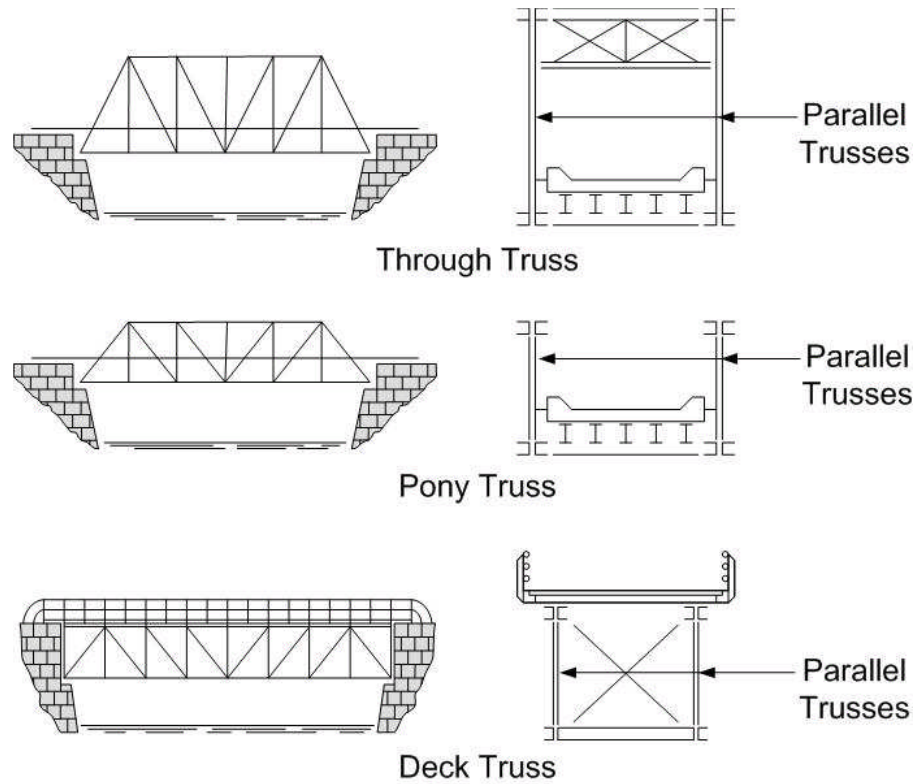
Through-Pony-Deck Truss Comparisons
